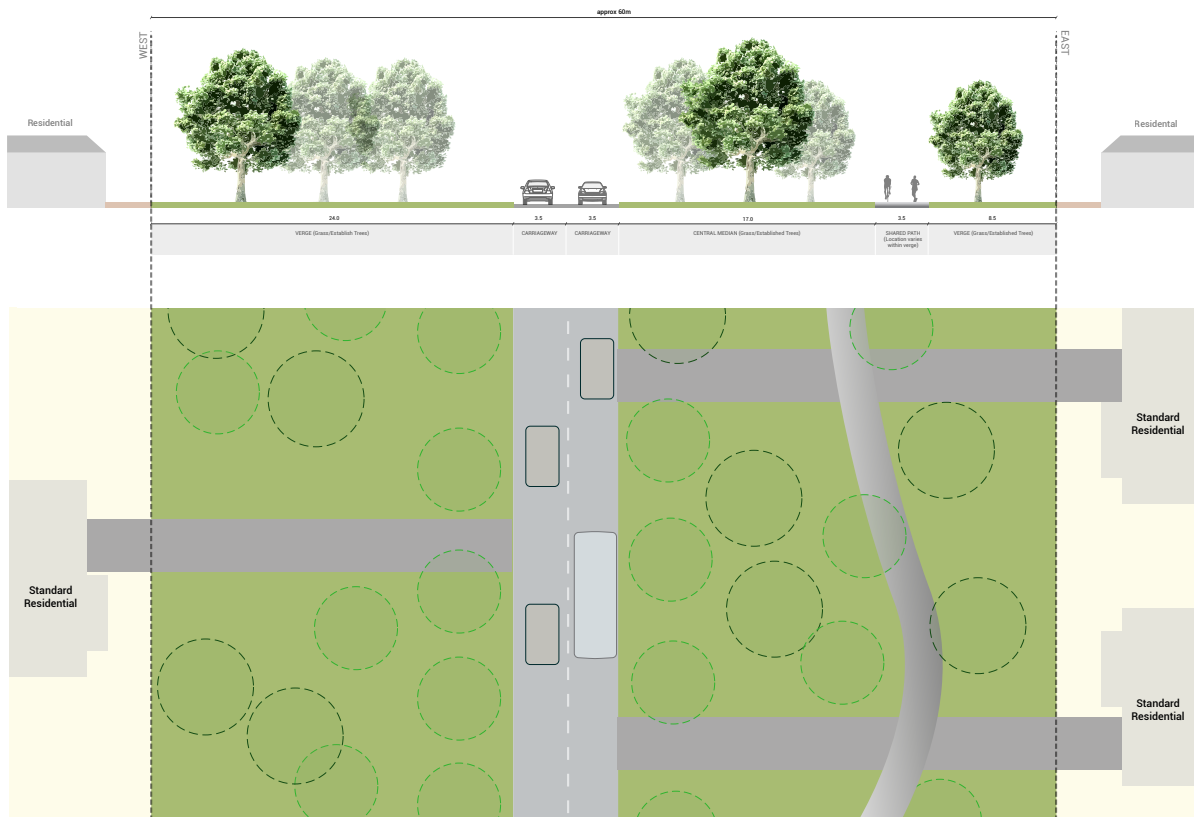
Boisdale Street Cross Section – between Hillcrest Drive & Cedarwood Drive
